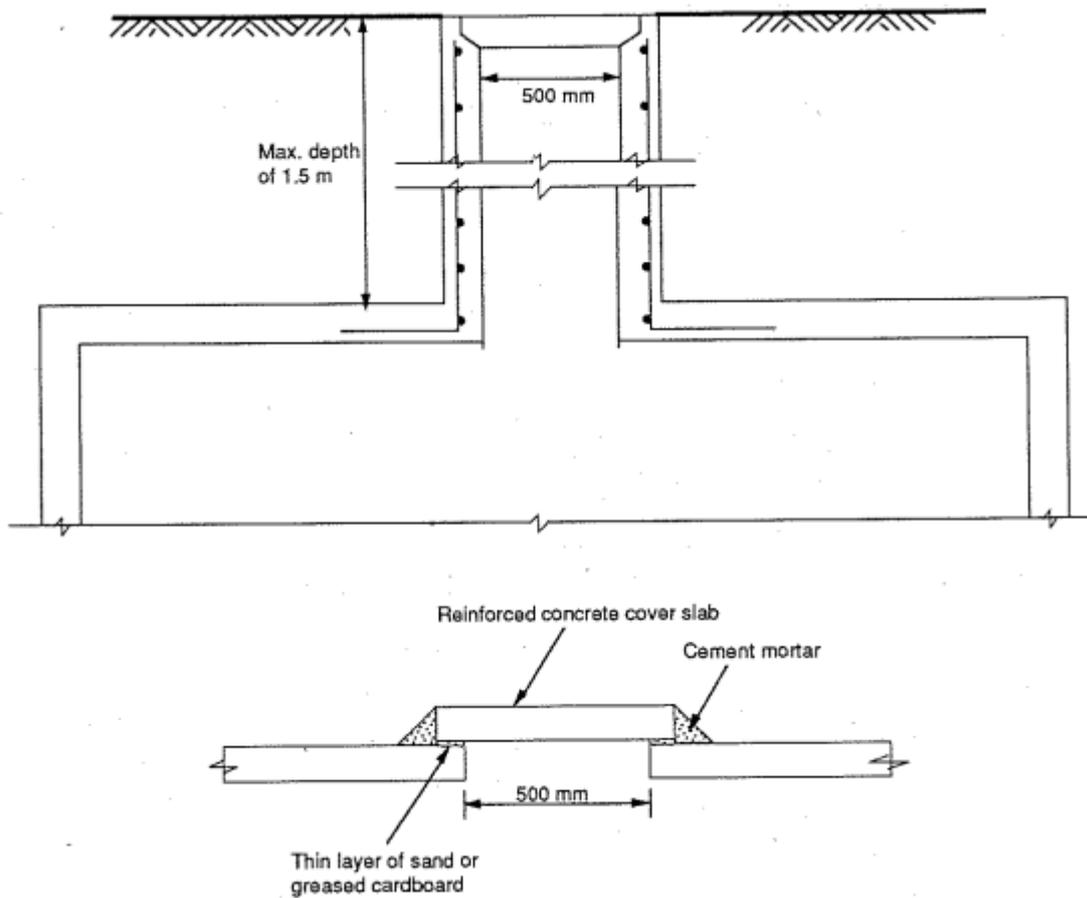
Two Alternative Methods of Providing Manhole Covers
